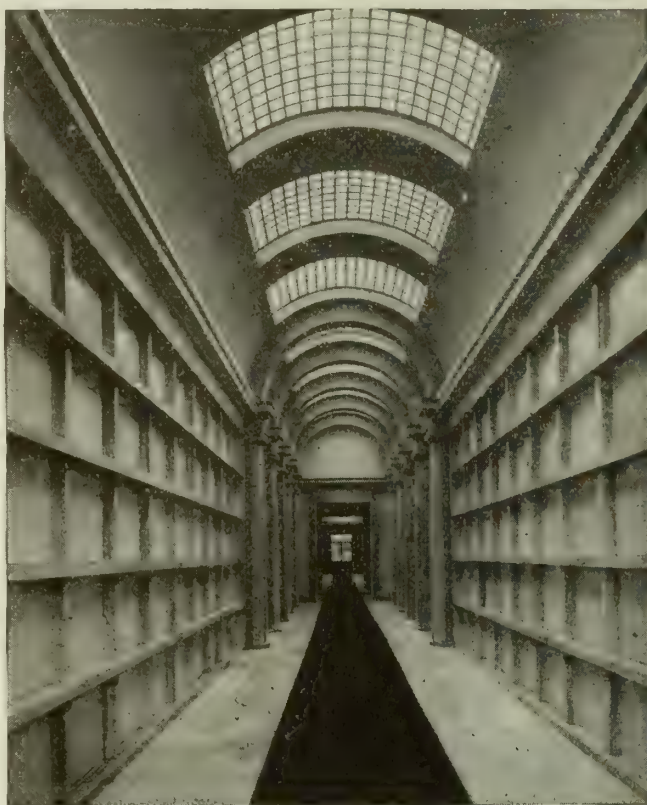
"BRUNER" FLOOR LIGHT CONSTRUCTION
